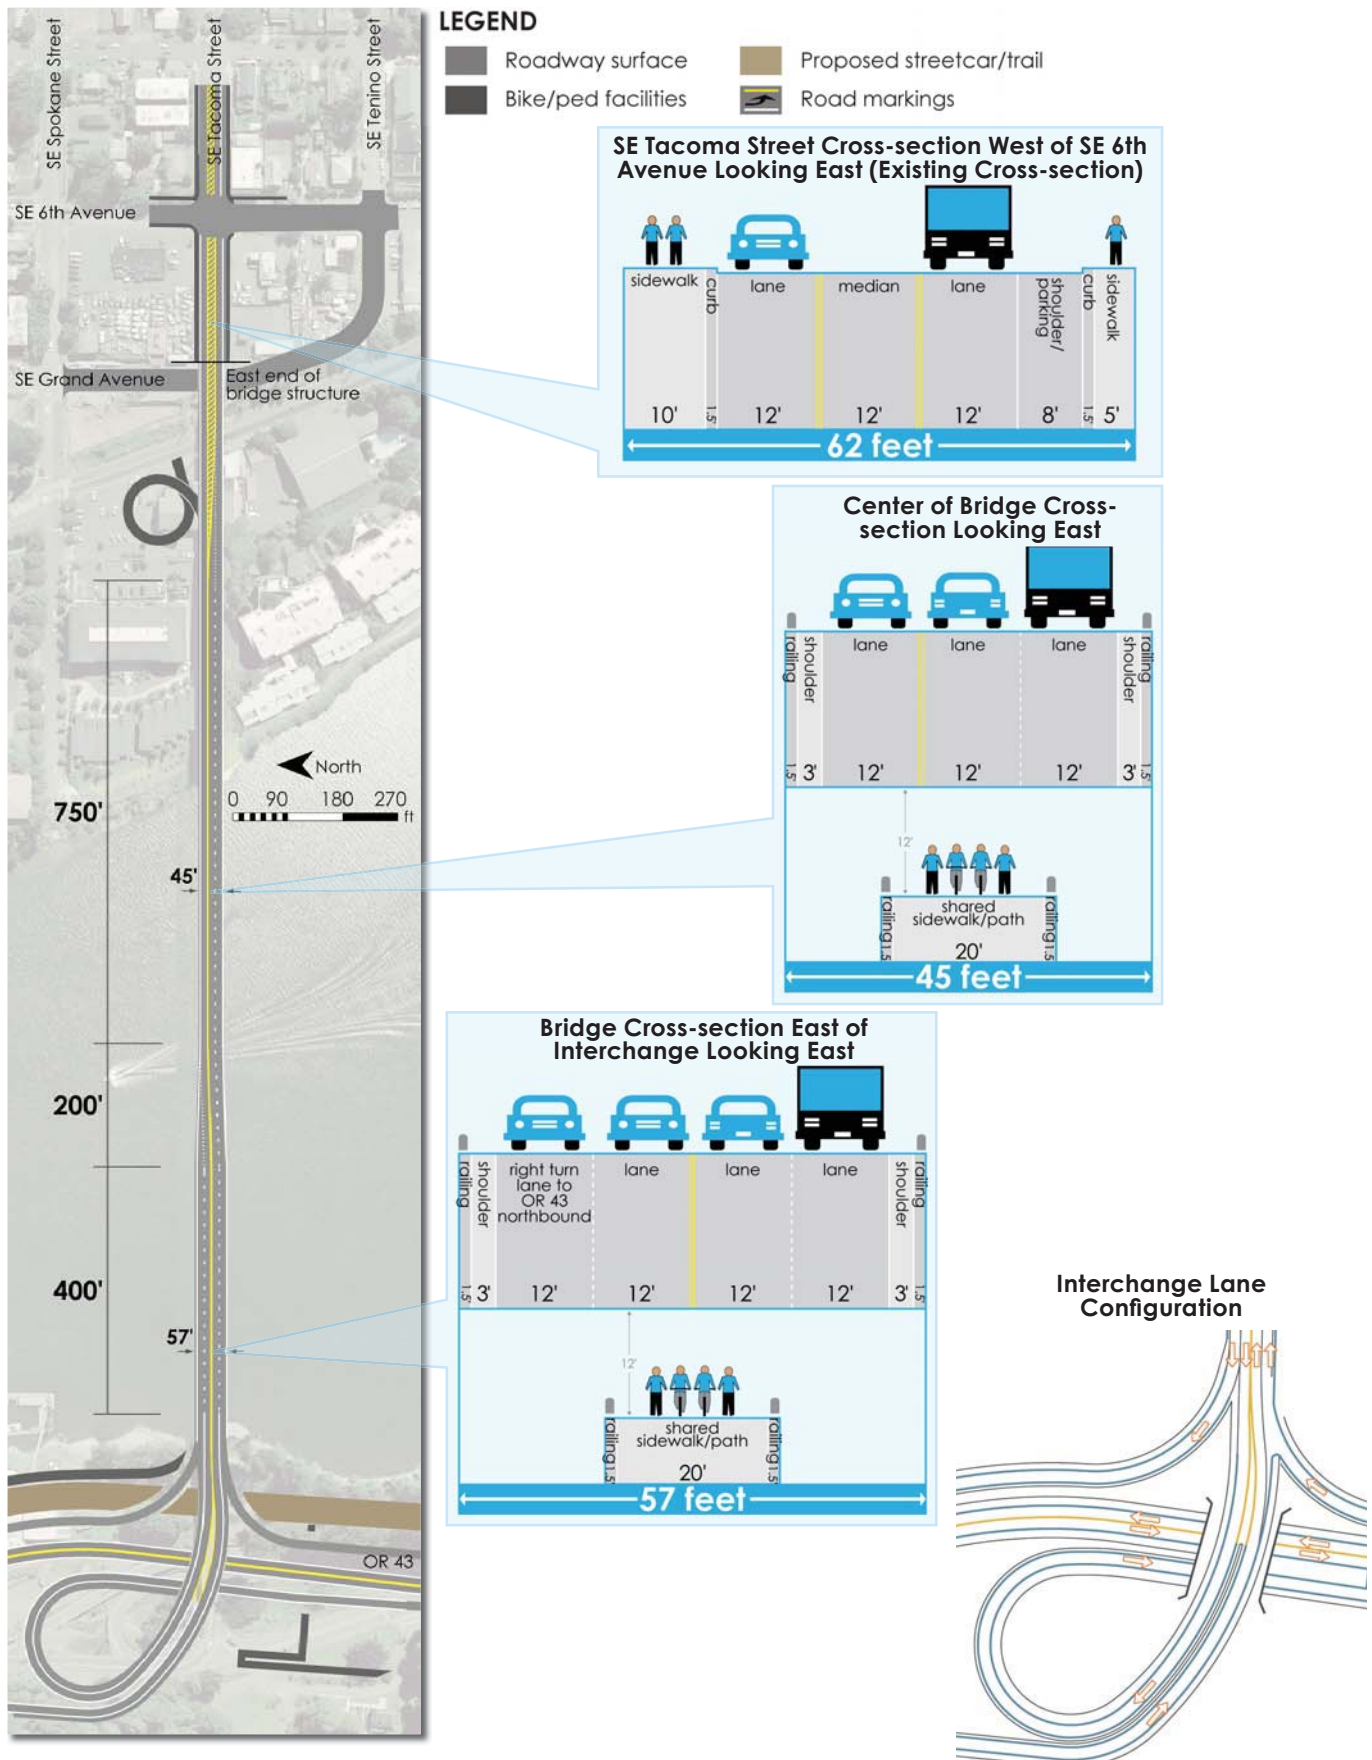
Alternative C: Replacement Bridge on Existing Alignment
